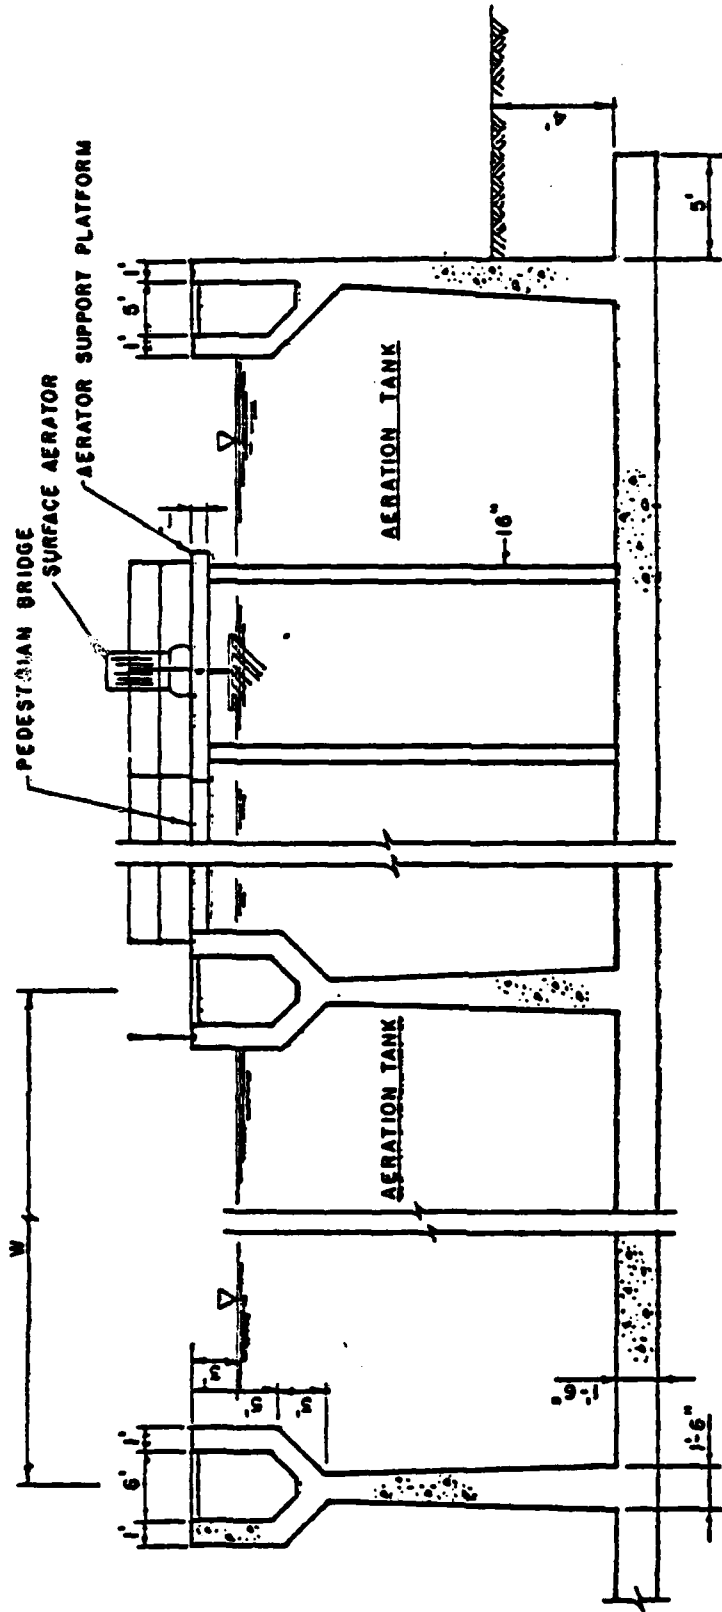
10 - TYPICAL SECTION OF COMPLETE MIX AERATION TANKS
